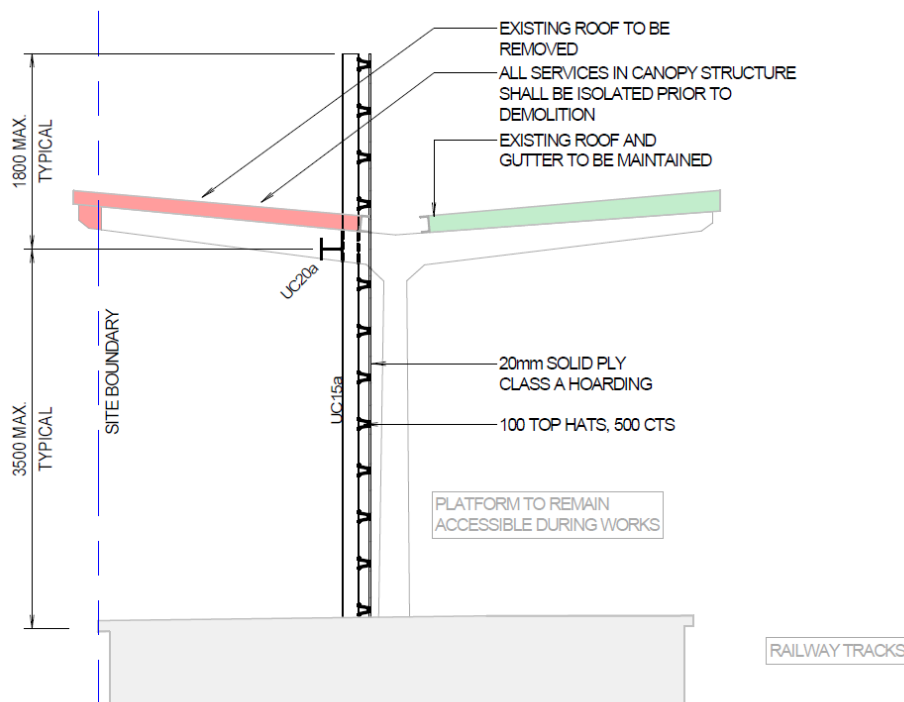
A-Class Hoarding Sections – Platform 1 Central Station
